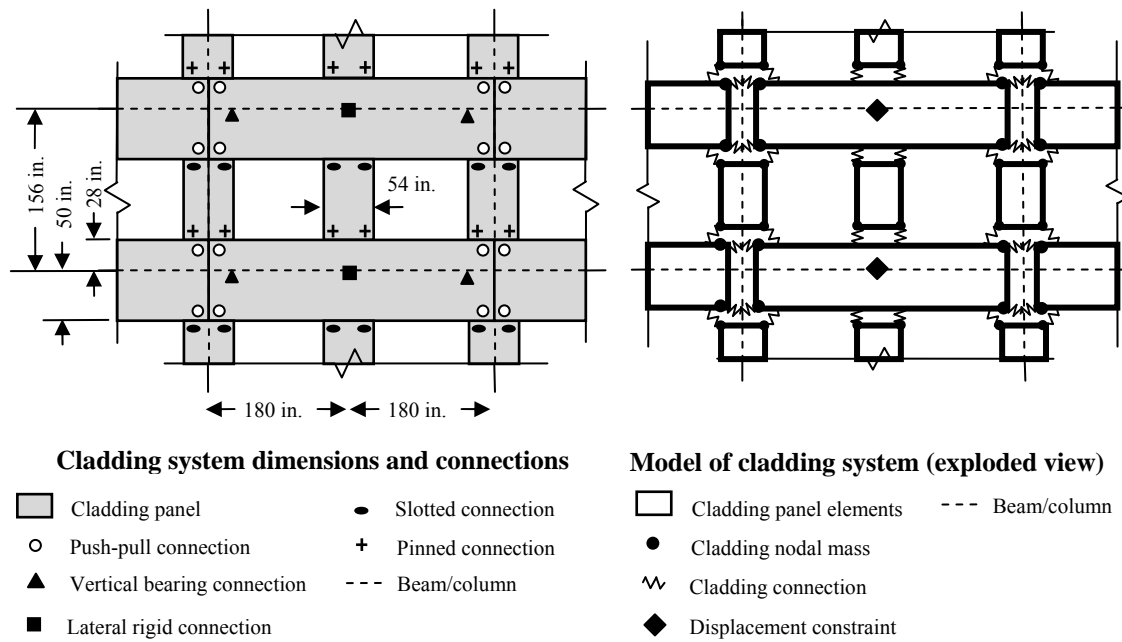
Detailed elevation of Model C3: (left) view showing connection types, (right) model view
